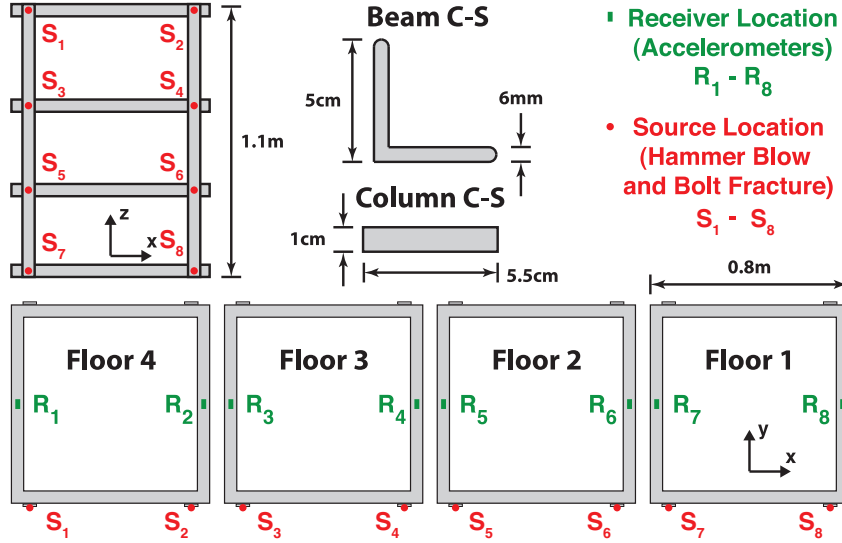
Steel Frame: Receiver Locations. The steel frame is instrumented with eight accelerometers in a layout that is similar to a instrumentation layout one might expect to find in the vibration monitoring of an actual building. The receivers record acceleration along the y-axis.
